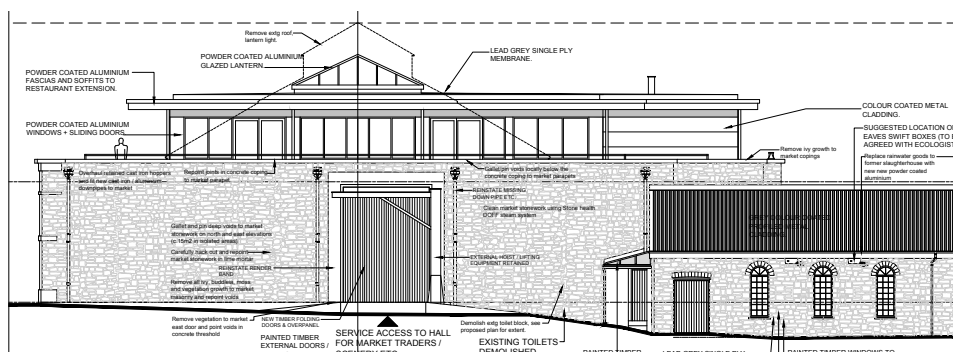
above: Consented south east elevation – source Pembroke Design Ltd
